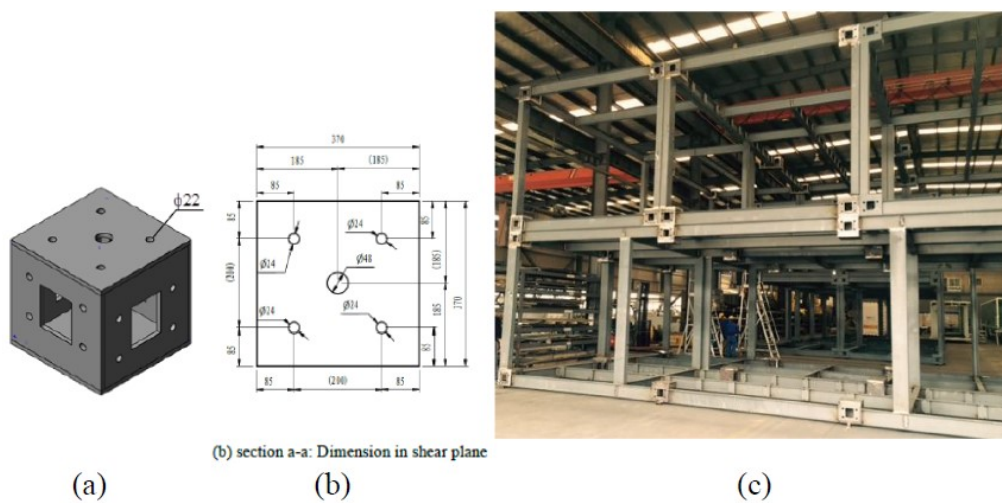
Steel bracket (a) design details and its (b) assembled modules in a warehouse [12].
